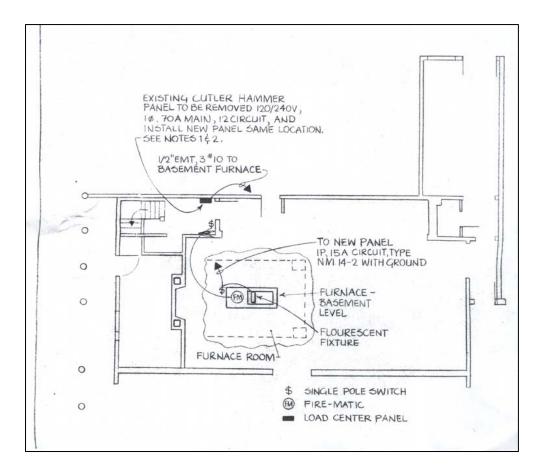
Little Studio, installation of new electrical panel: basement level plan, 1995.
